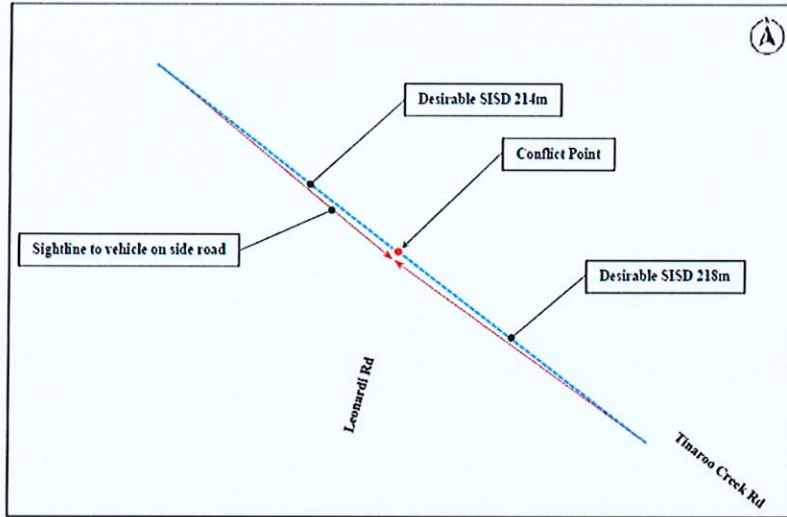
Tinaroo Creek Road/Leonardi Road Intersection - SISD Assessment
